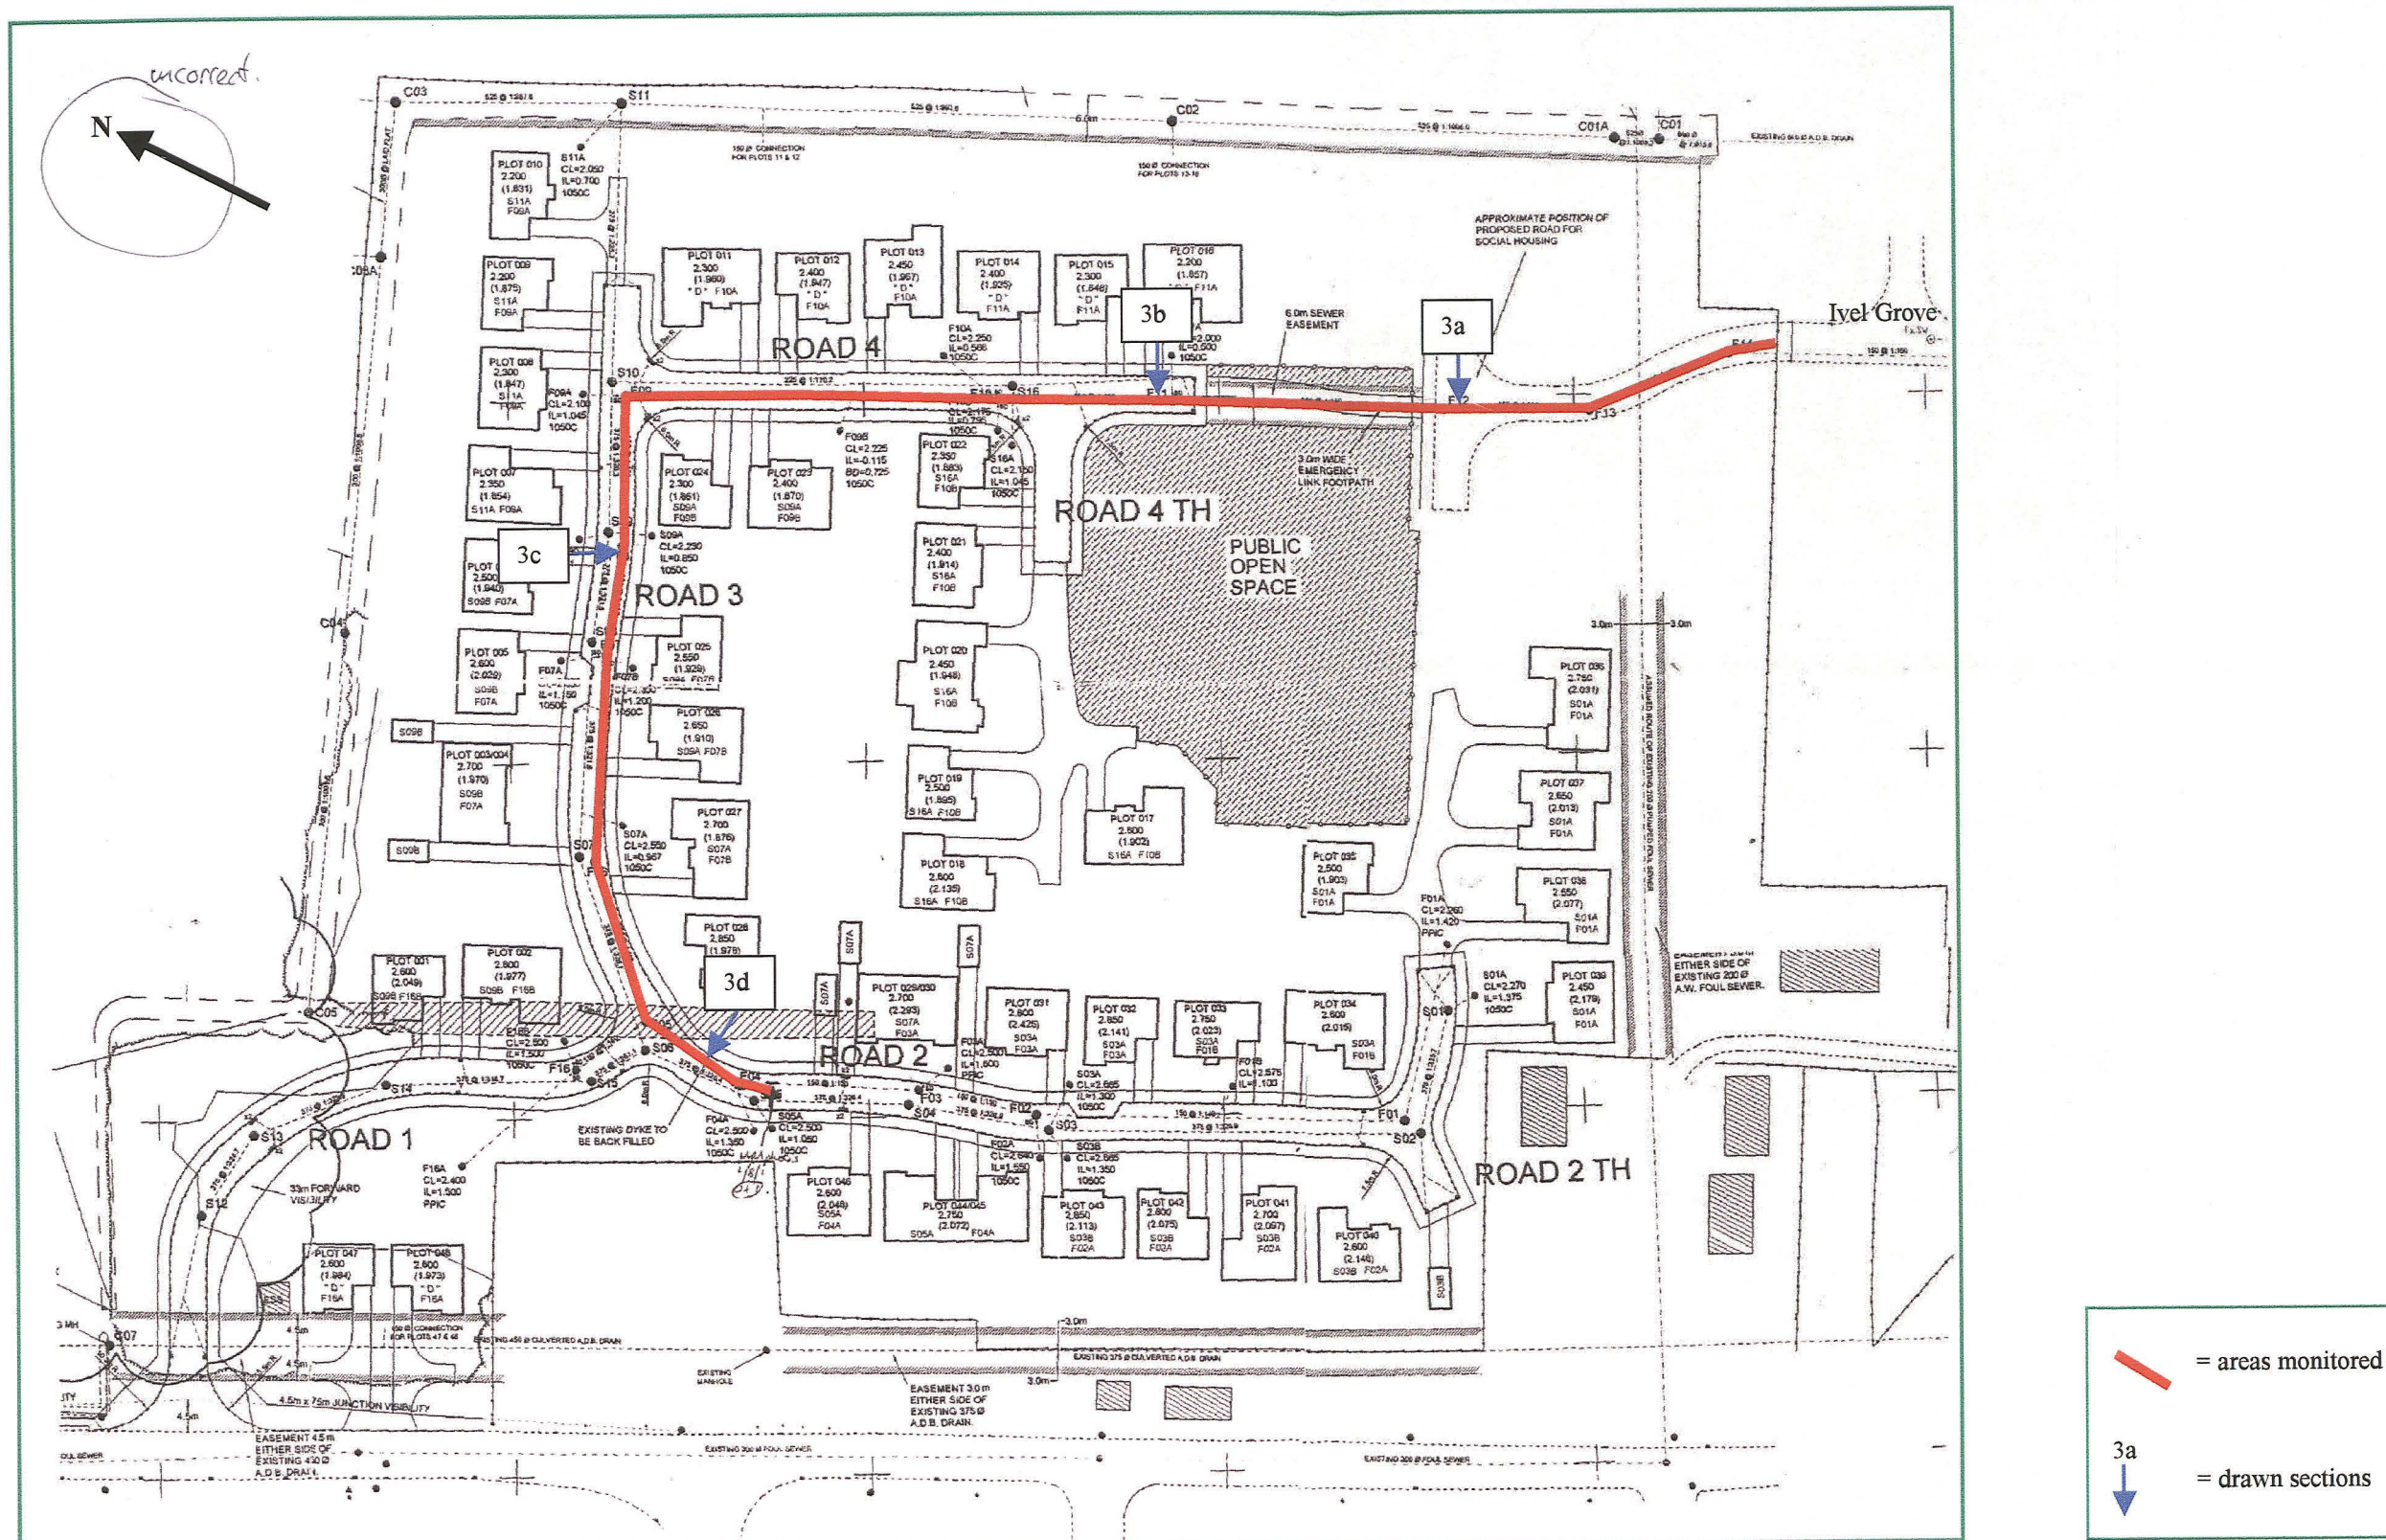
Site location, showing areas monitored and location of representative section drawings (figs 3a-3d) (scale 1:1000)
